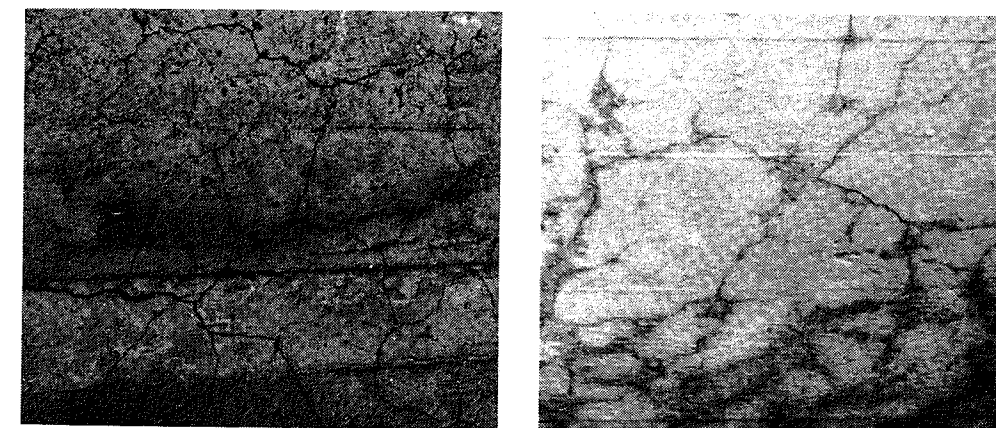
left, right. Two aspects of map cracking on massive concrete blocks.
